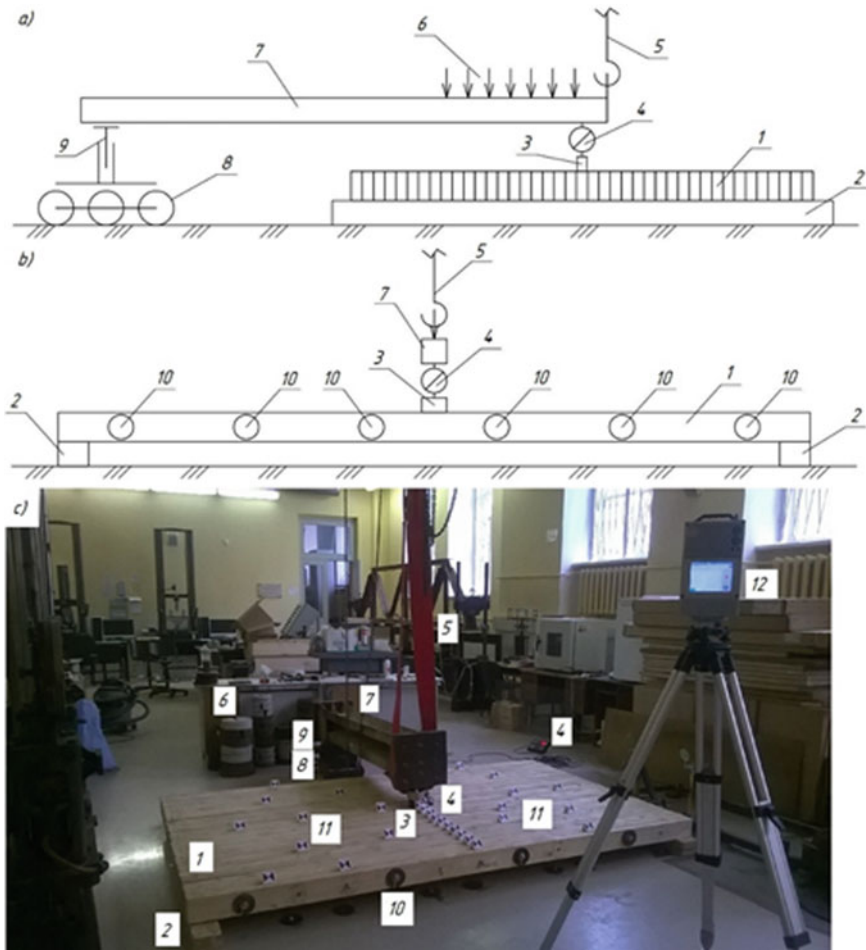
Testing set: a side view; b front view; c assembled set, general view; 1—stress-laminated timber deck; 2—support beam; 3—steel element; 4—dynamometer; 5—hoist; 6—loading units; 7—loading beam; 8—horizontal adjustment; 9—vertical adjustment; 10—washer; 11—points (signs); 12—laser scanner
